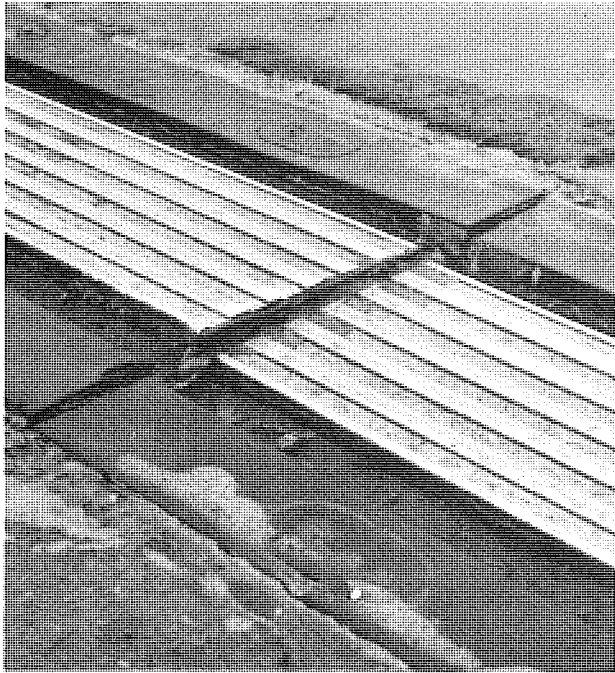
Waboflex SR2.5 (CS 82-240). Vertical misalignment of sections, poor sealing, and wide gap between sections.
